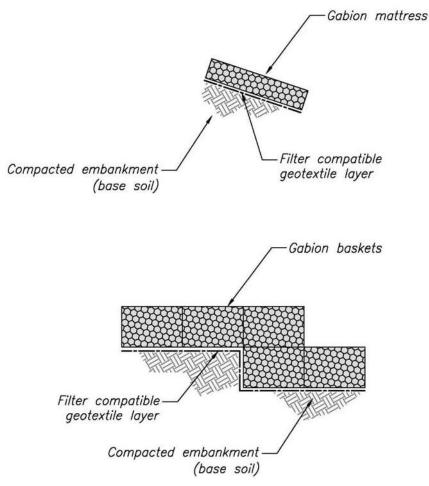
Example geotextile bedding layer for gabion construction (Reclamation, courtesy of Chris Ellis).
